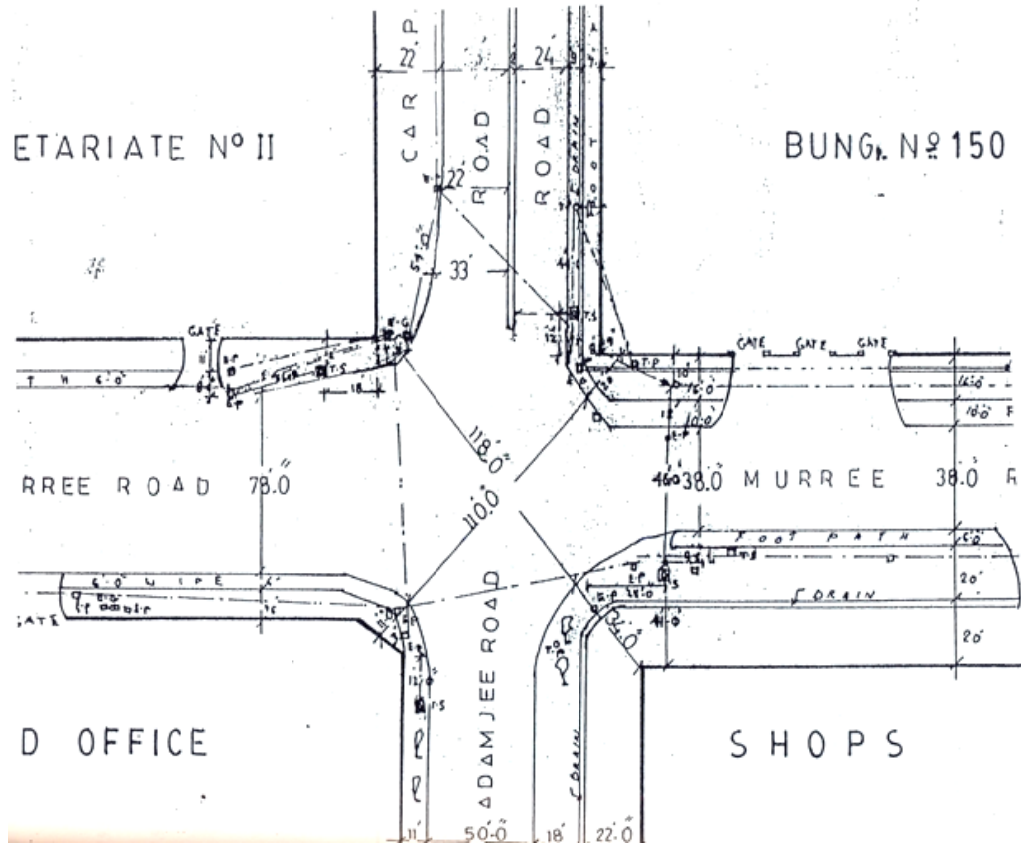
10 Intersection Murree Road/Adamjee Road -Present Situation
